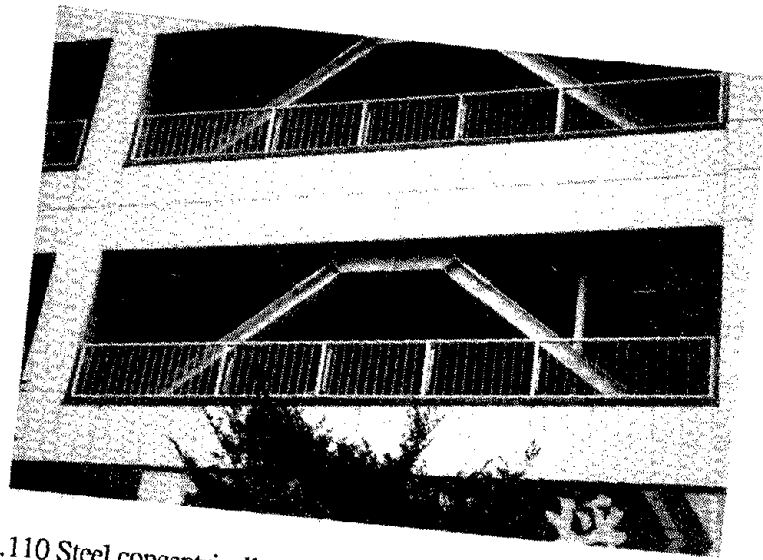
Steel concentrically-braced frame in building shown in Figure 6.109
